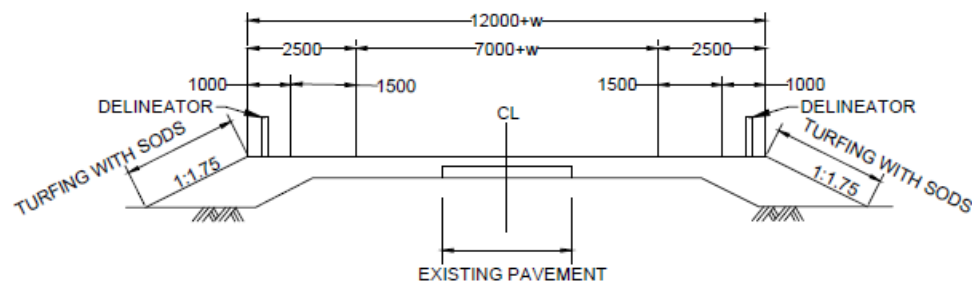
(1): Typical Cross Section – Type 1 (Plain and Rolling Terrain – Formation in Embankment)
